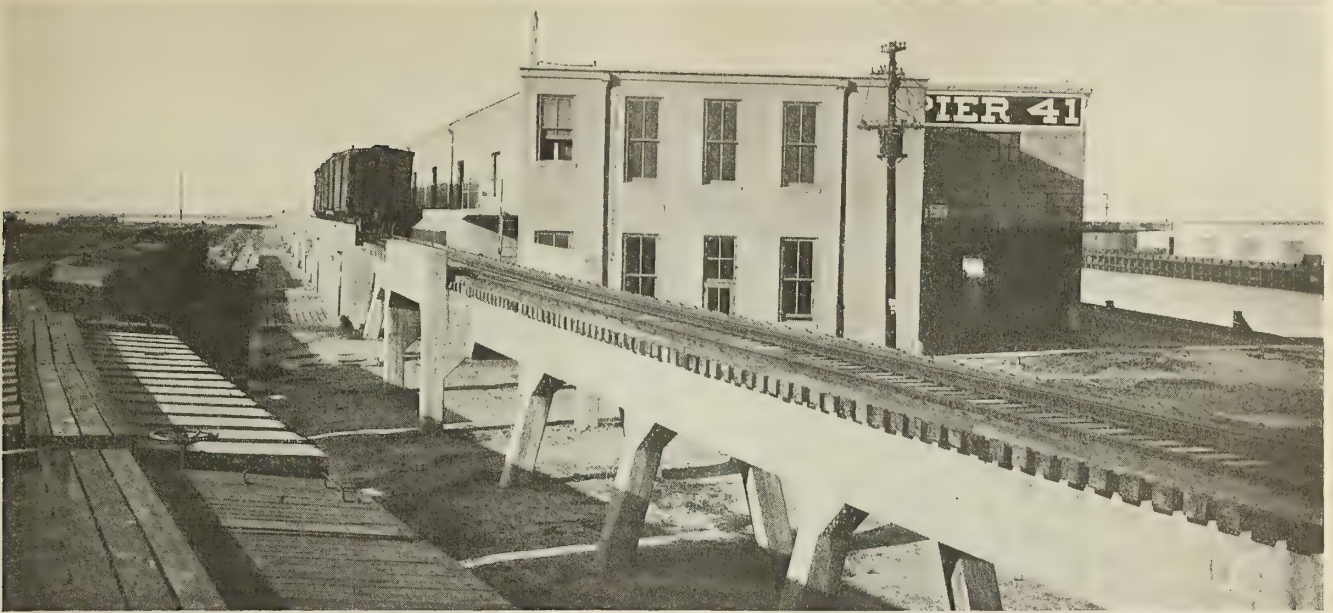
Pier No. 41, Galveston, Texas. A Reinforced Concrete Trestle Bridge Gives Permanent and Uninterrupted Track Service to This All Concrete Pier
